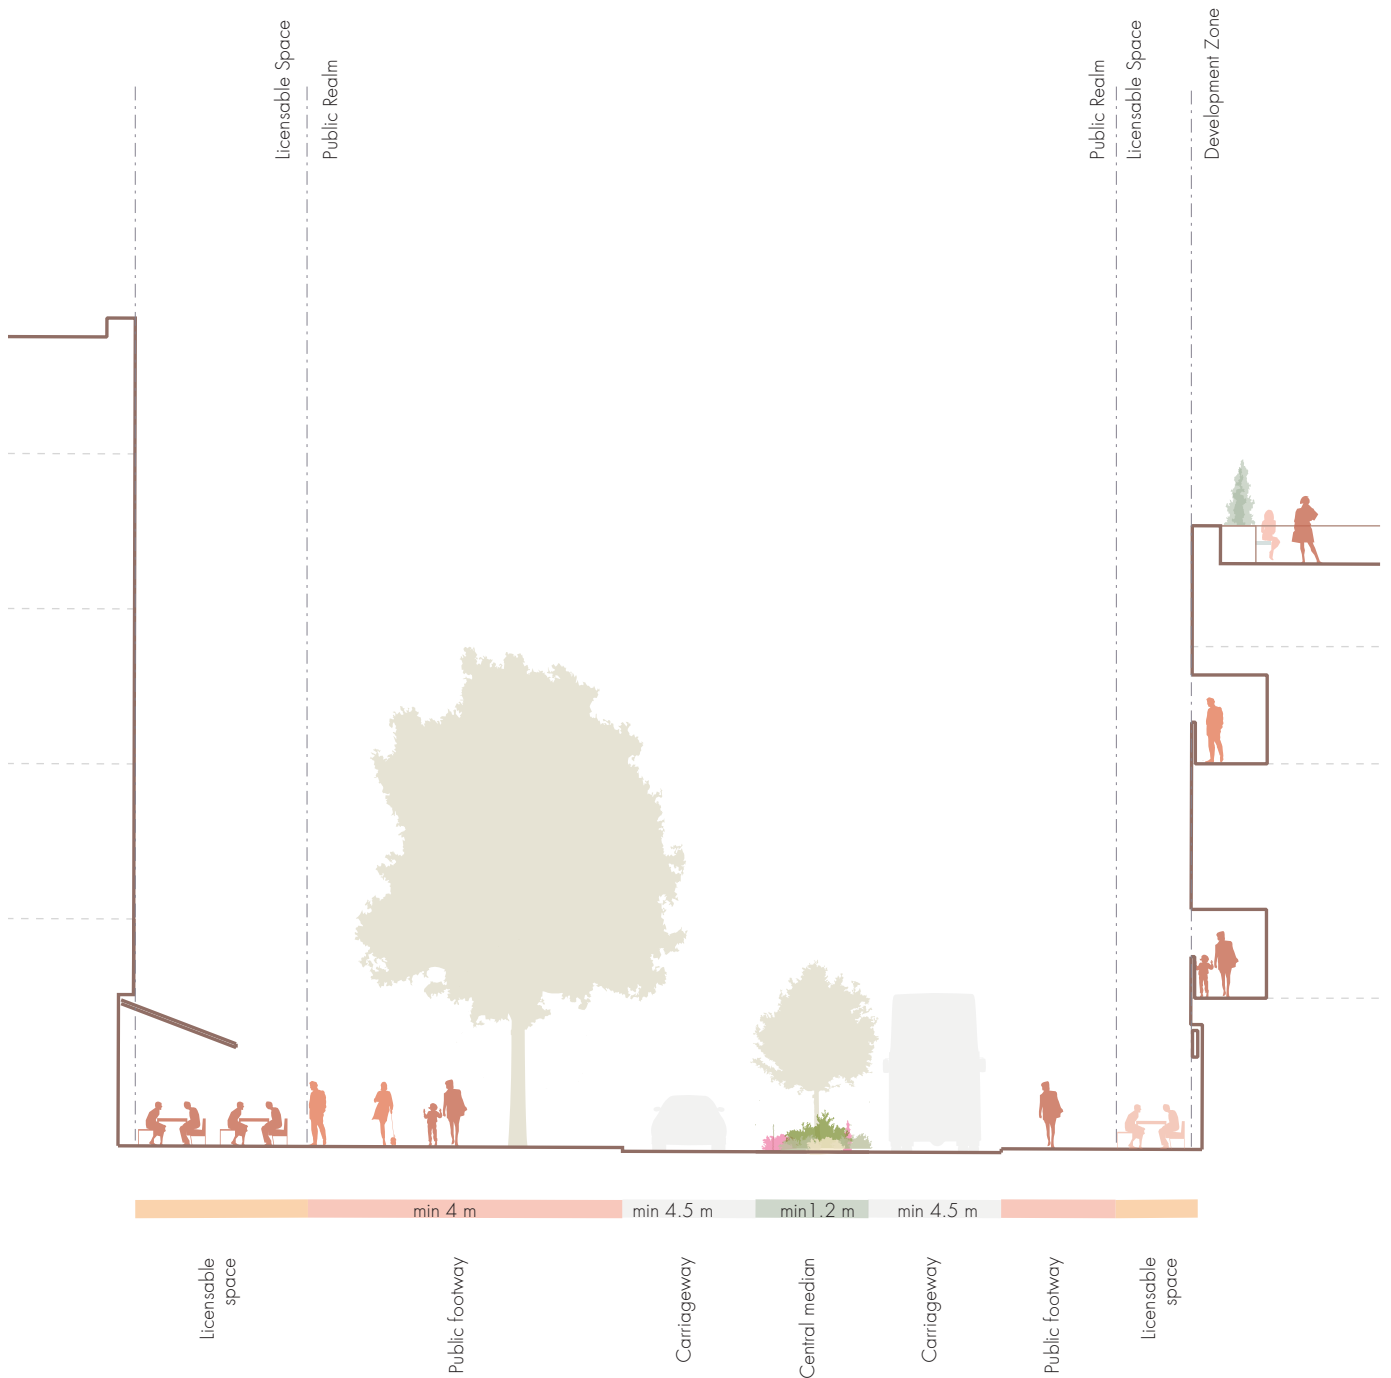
Illustrative section showing Cinder Street with planted median in the carriageway
